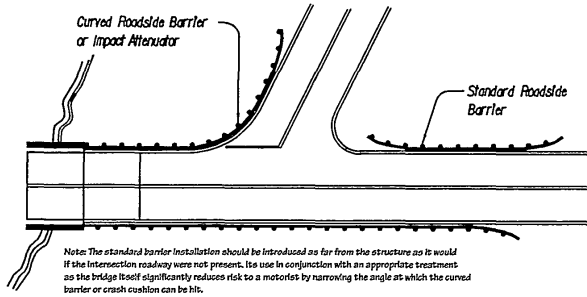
Possible Solution to Intersecting Side Road Near Bridge
